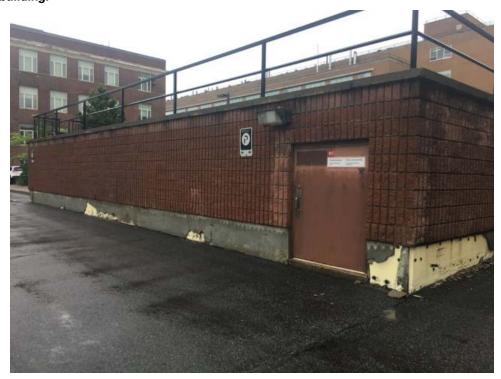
Looking northeast at the butler hut building located on the eastern portion of the Site.
